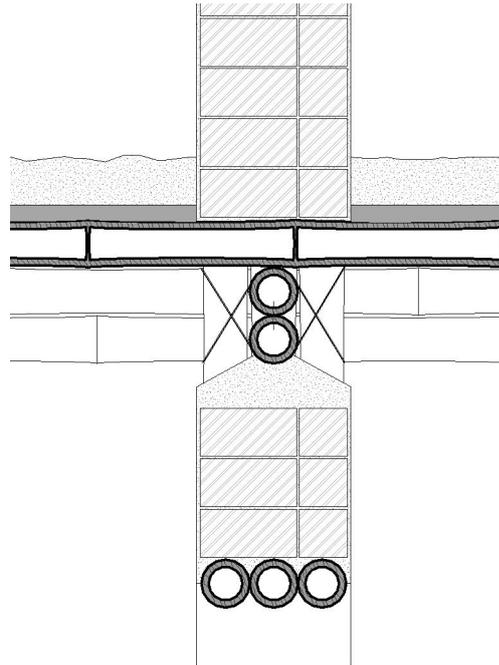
Central window/doorway detail extracted from the section in Figure 23
